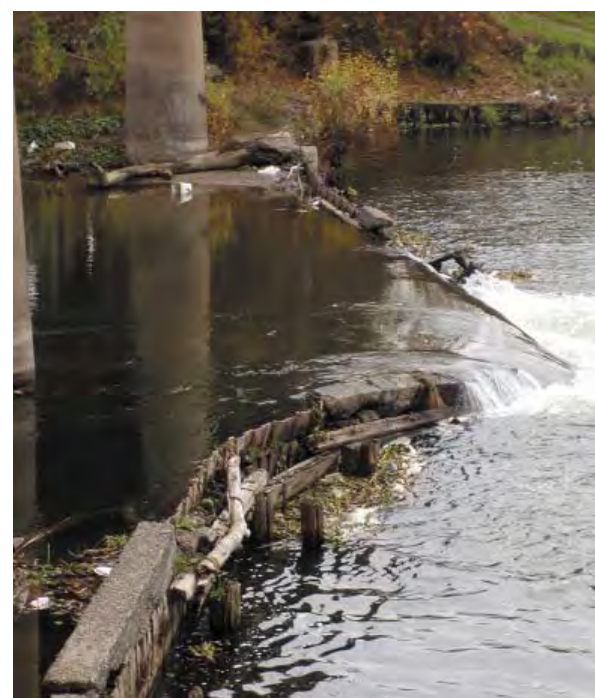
View of Dennett Dam, located under the 9th Street Bridge, 2003. The TRRP Master Plan recommended its removal to improve fish migration and permit boat passage on the Tuolumne River.
